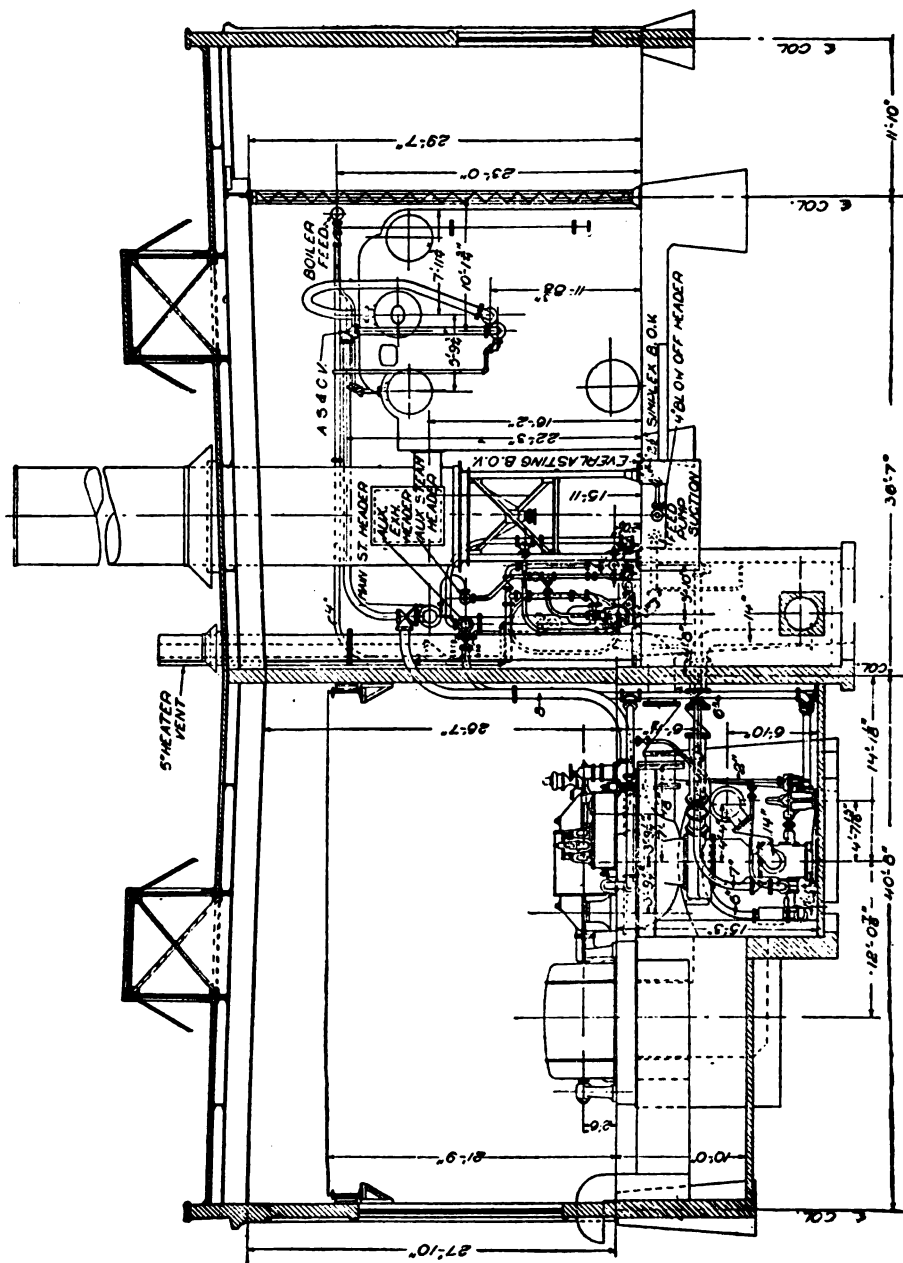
SECTION THROUGH ENGINE- AND BOILER-ROOM.
